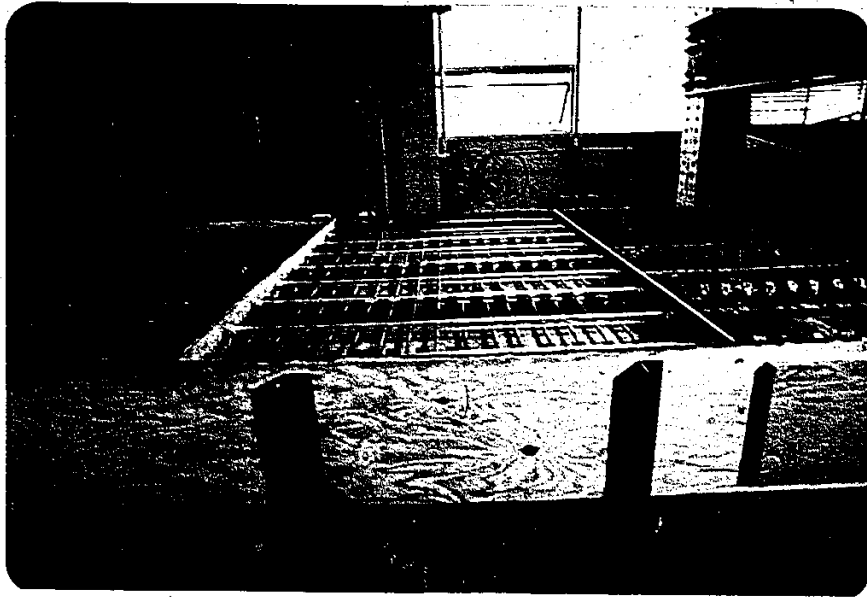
TRANSVERSE REINFORCEMENT IN PRE-STRESSING SLAB.
